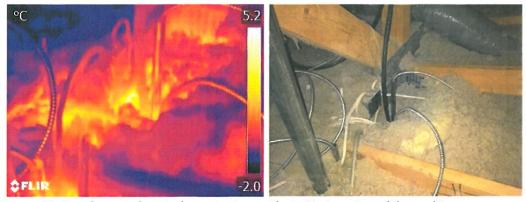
Heat loss at electrical penetrations Photo 35: Location of thermal image
